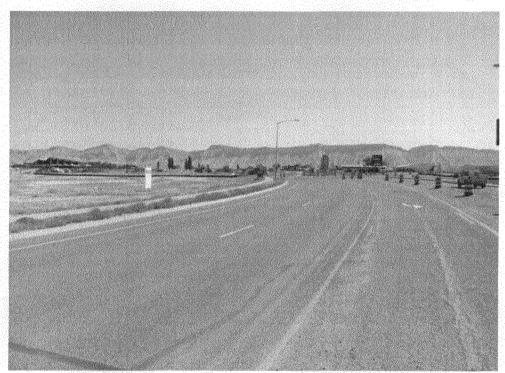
Horizon Drive access location (on immediate left) facing northeast..
